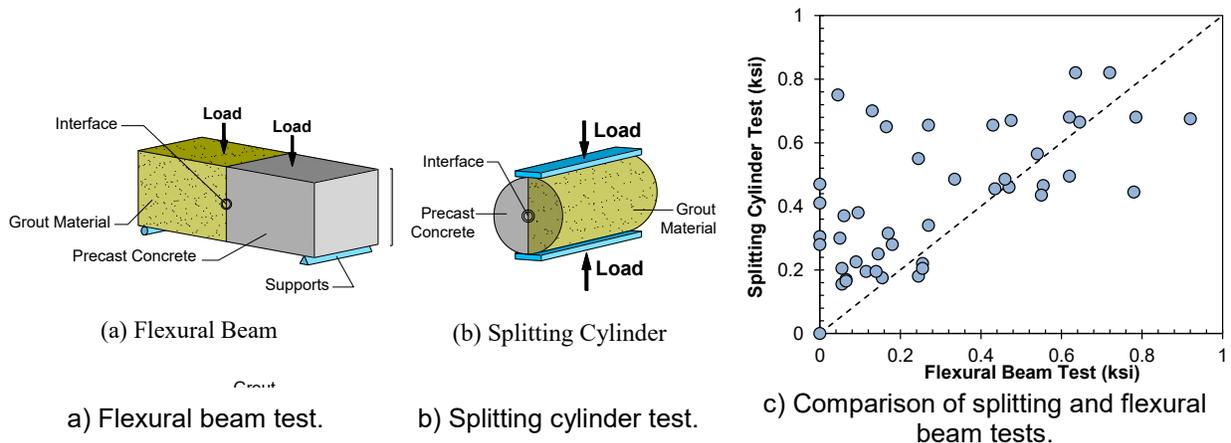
Grout-to-concrete interface bond testing. Source: FHWA.
